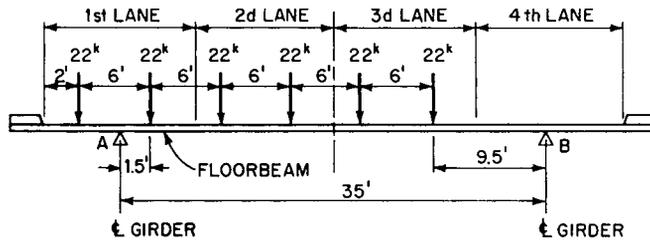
Positions of loads for maximum shear at A in main span of floorbeam.
